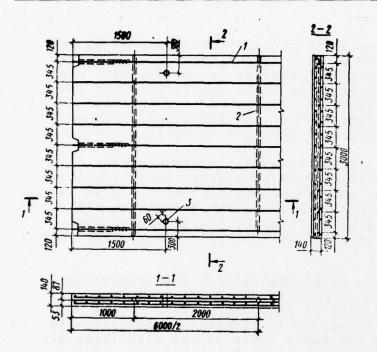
Smeoth, rectangular slab: 1-operating reinforcement; 2-channels for installing transverse stressed reinforcements; 3-aperture for lifting the slab.
